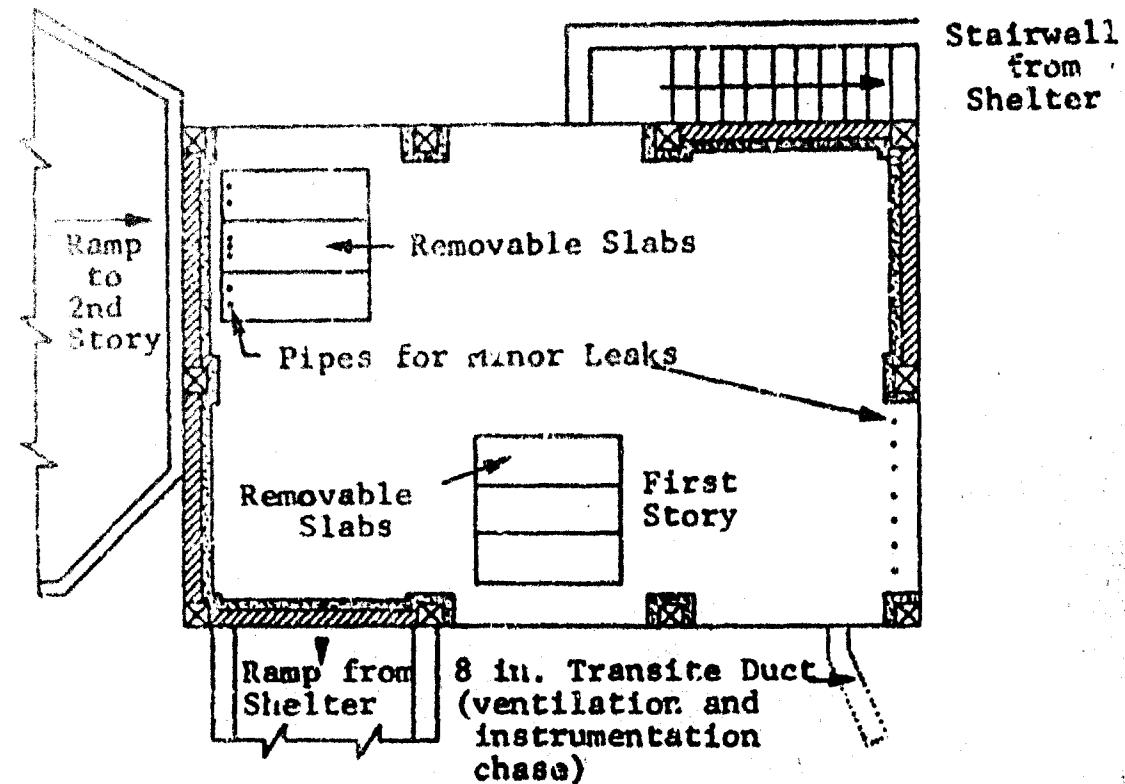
FIRE TEST STRUCTURE AND SHELTER ENTRANCES
